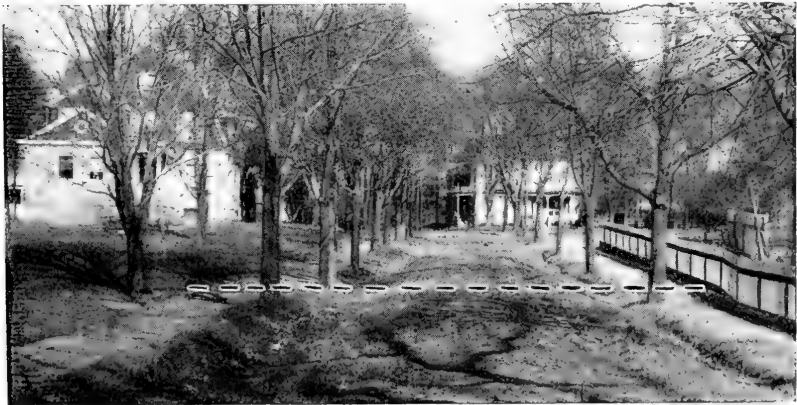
Street grade raised two feet without changing sidewalk or injuring trees. Practicable only on a side street.
